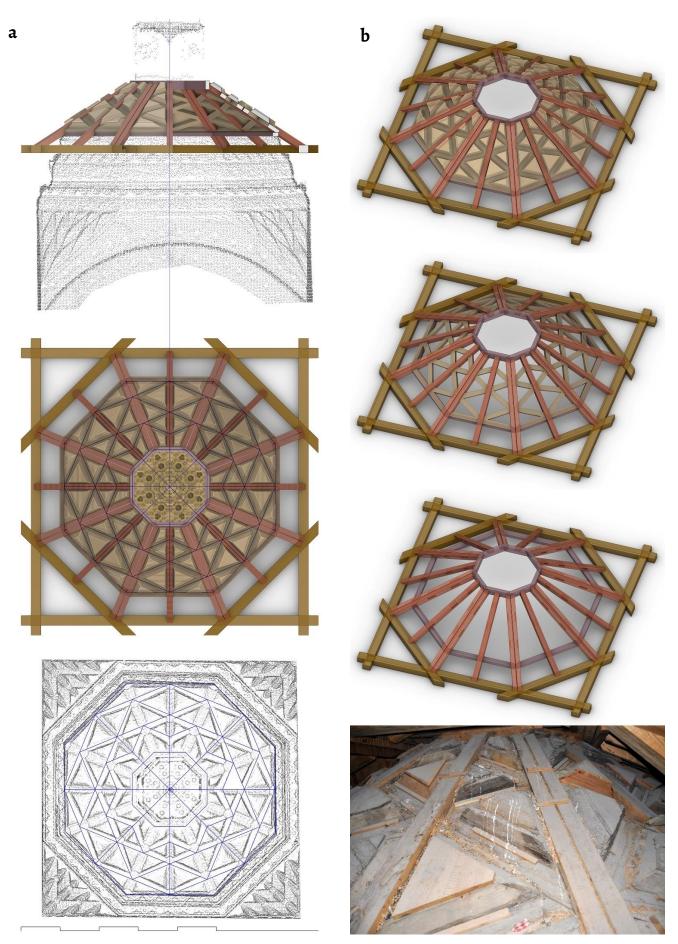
Octogonal dome: *a*) of the transept: elevation/section of the structure, plan and orthoimage from scanner laser; *b*) Structure: construction process and detail of its extrados.
